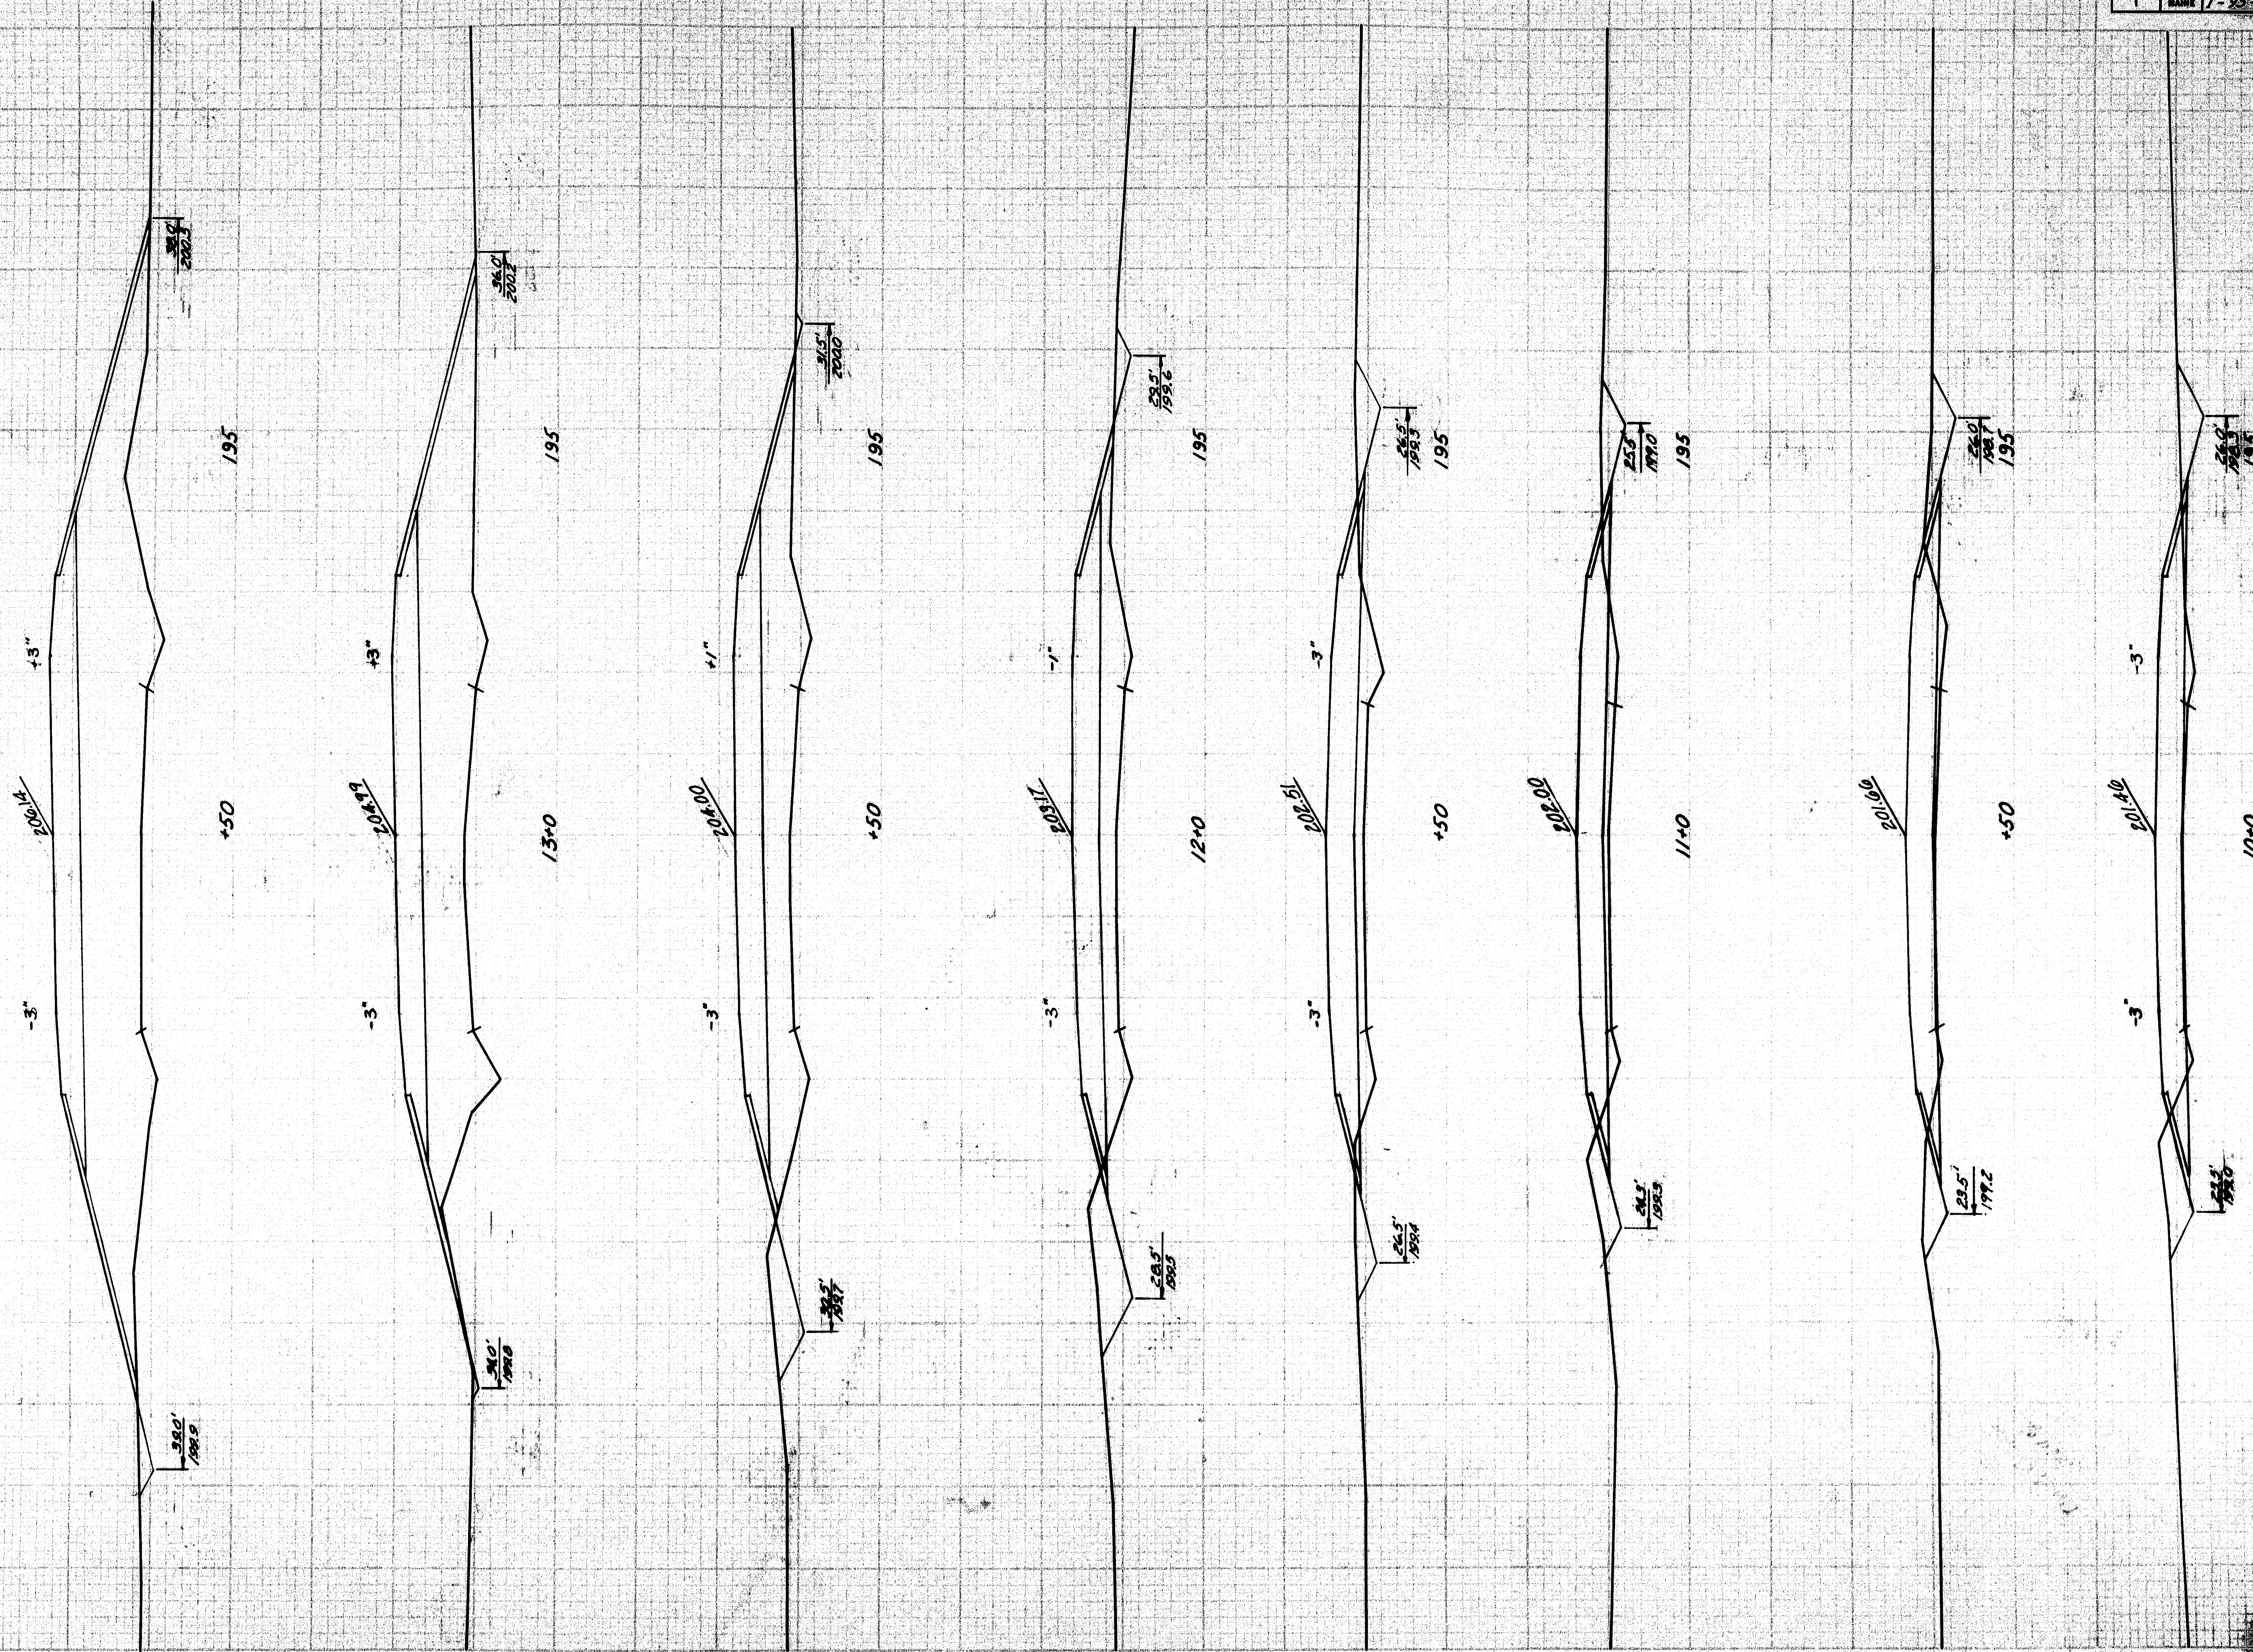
CROSS SECTION OF JOHNSON FLAT ROAD
